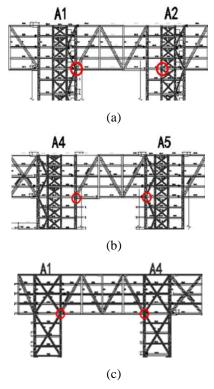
Positions of joints for stiffness updating. (a) truss A1-A2. (b) truss A4-A5. (c) truss A1-A4
